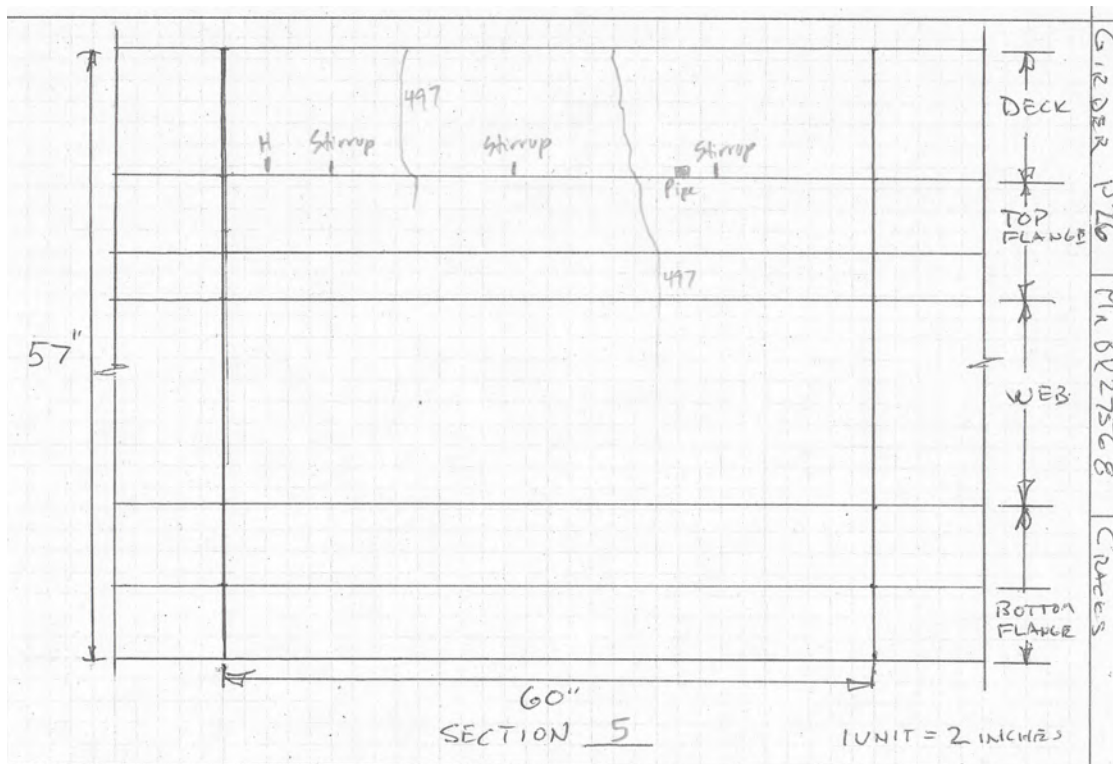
Girder P26 crack pattern – Section 5
